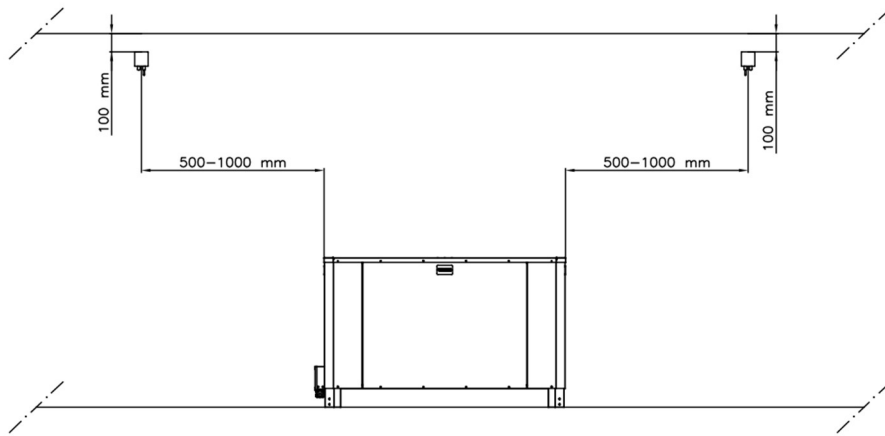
Installation Area When Sensors Are Mounted on the Ceiling
